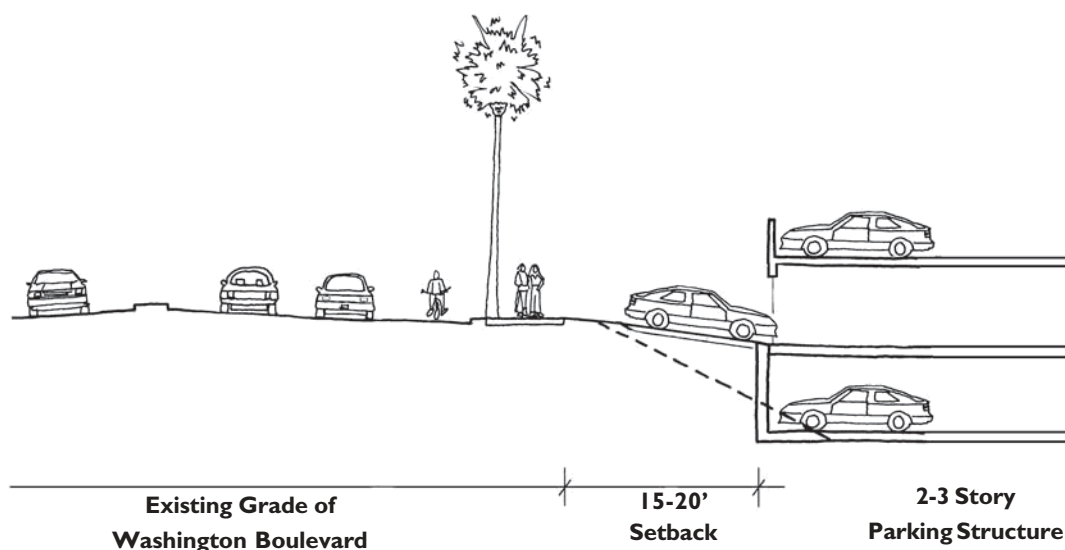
Washington Boulevard Bridge and Parking Garage
